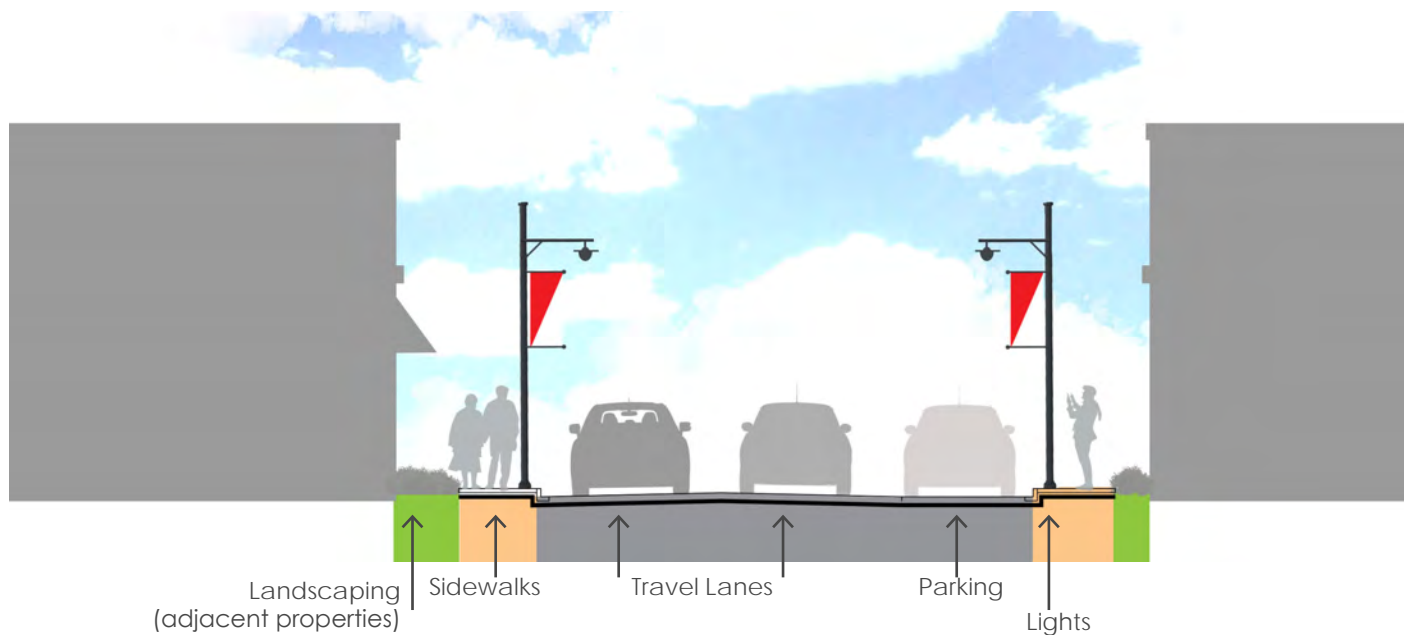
WYCOFF AVE. PROPOSED STREETScape DESIGN – TYPICAL SECTION
